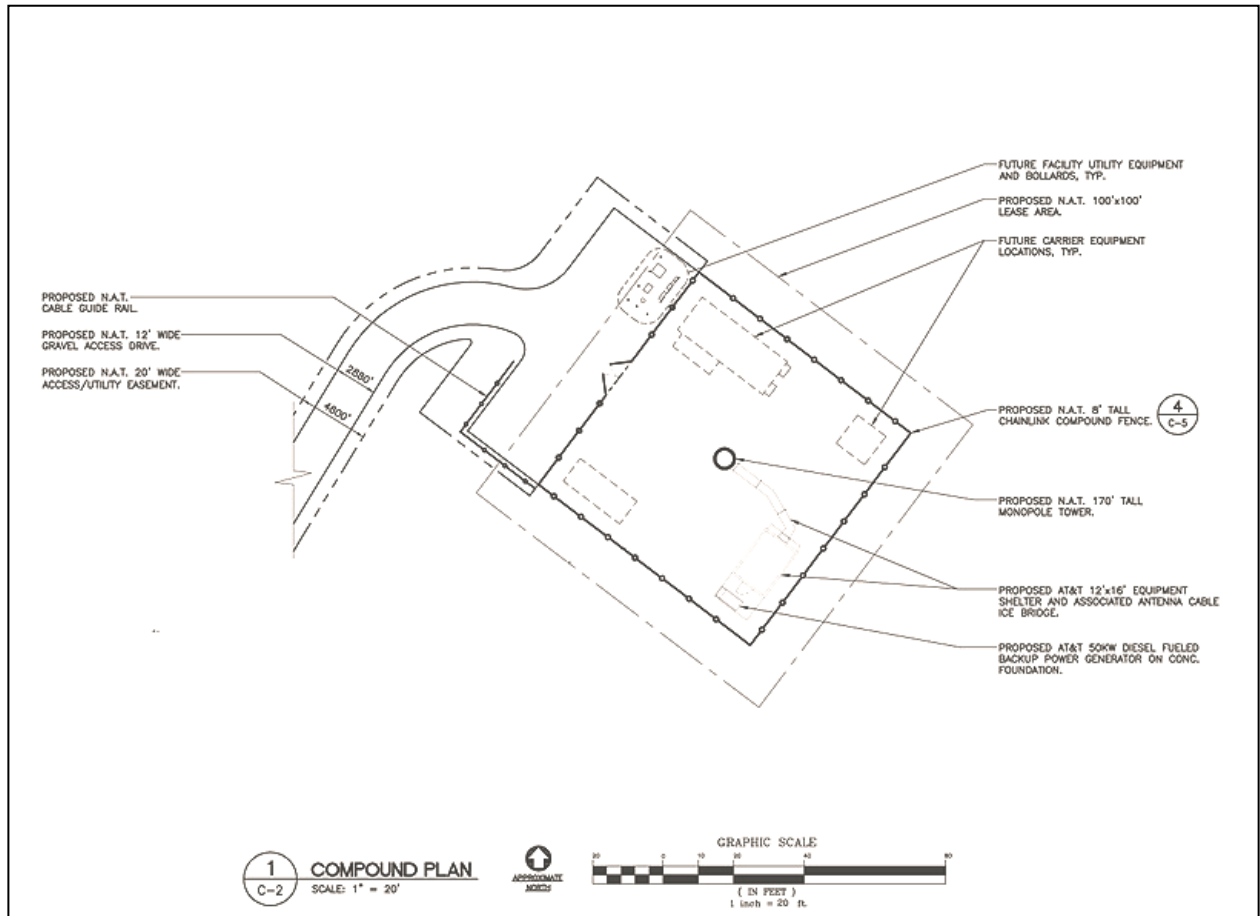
Plan view of proposed lease area and access road associated with Alternate 2 (note that no shovel tests were excavated in this area since it was disturbed).
